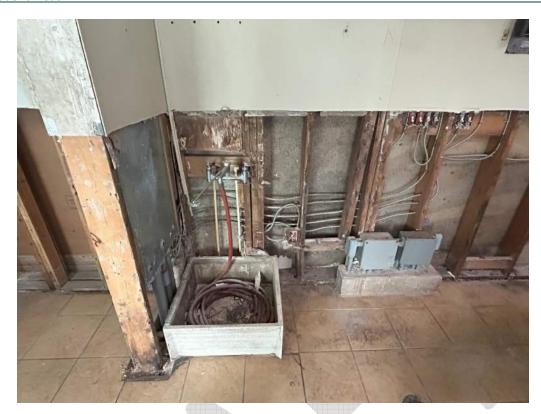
Broken and Rutten Wood Studs at Interior Wall Wood Frame due to Water Intrusion.
